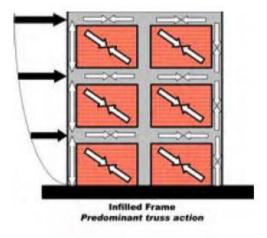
Infill masonry walls acting as part of the main lateral system (EERI, 2006).
